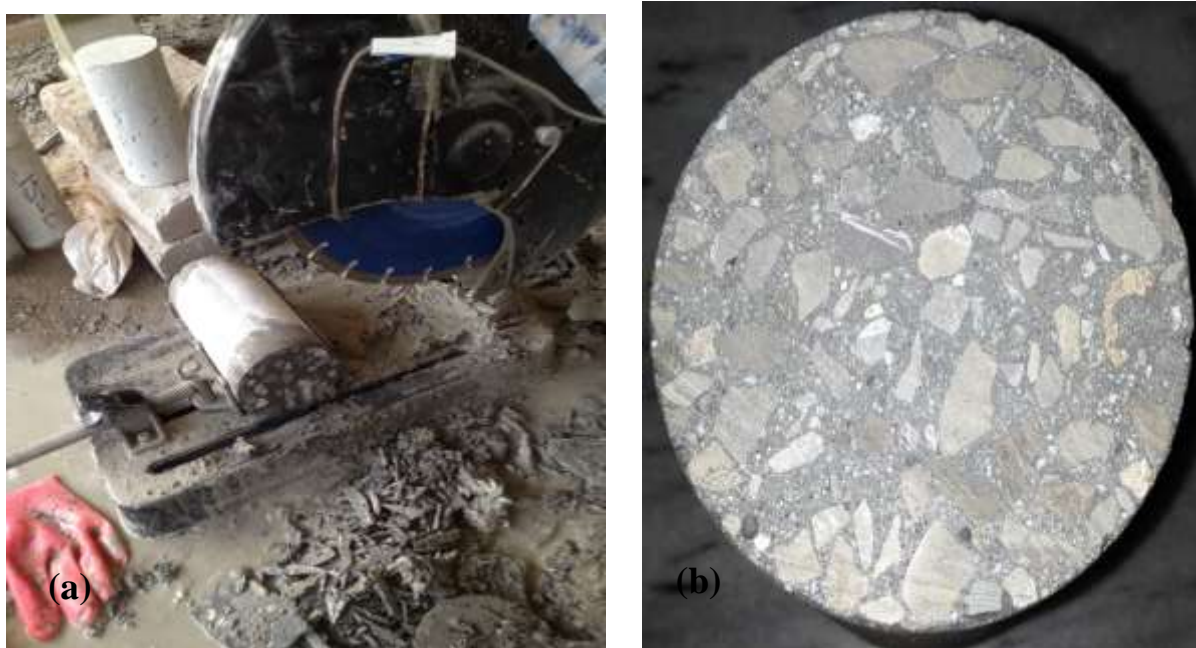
(a) Diamond cutter (b) smooth end of a specimen after grinding
